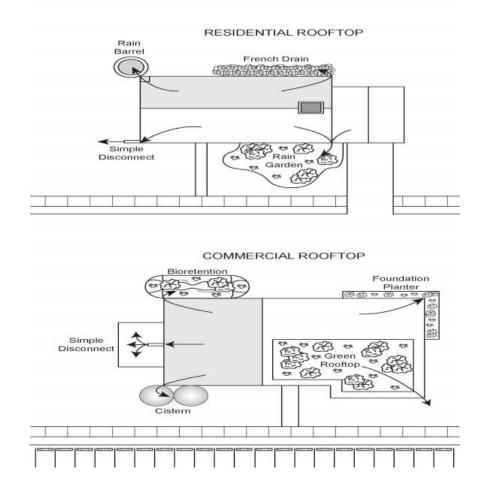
Roof Disconnection with Alternative Runoff Reduction Practices
